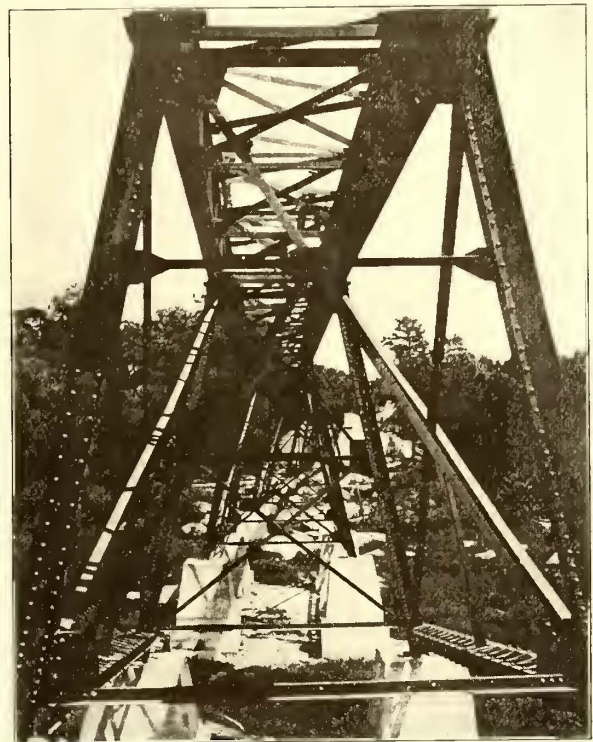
Boyertown & Pottstown Railway—Details of the Steel Towers of the Ringing Rocks Viaduct
